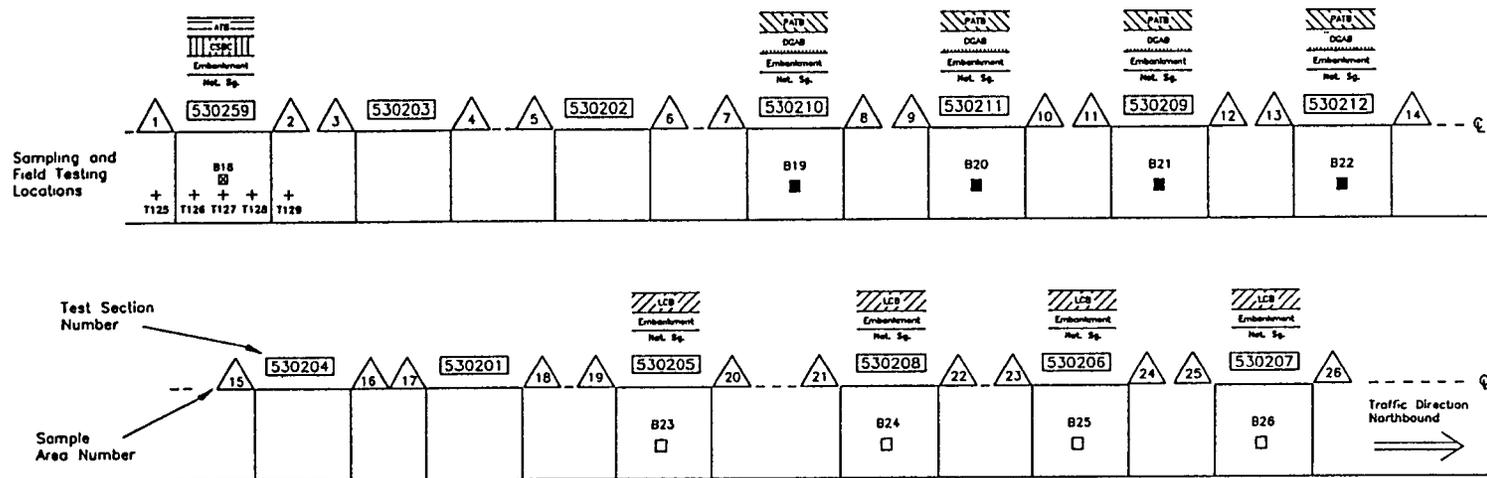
Overview of material sampling and testing on Prepared Subgrade or Embankment, SPS-2 Washington'
